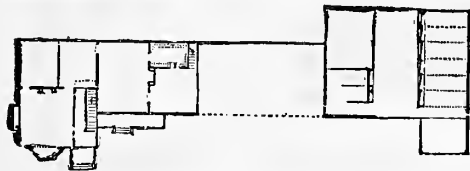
CONDENSED PLAN OF THE BUILDINGS.
